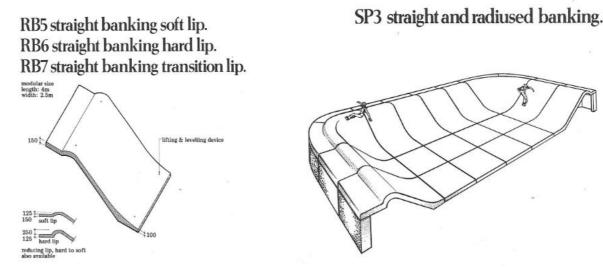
Left: Typical precast banked unit from Radical Banking catalogue Right: Typical sectional arrangement using banked units on wall sections with flat panel bottom pieces (note; Kennington is larger in arrangement)
